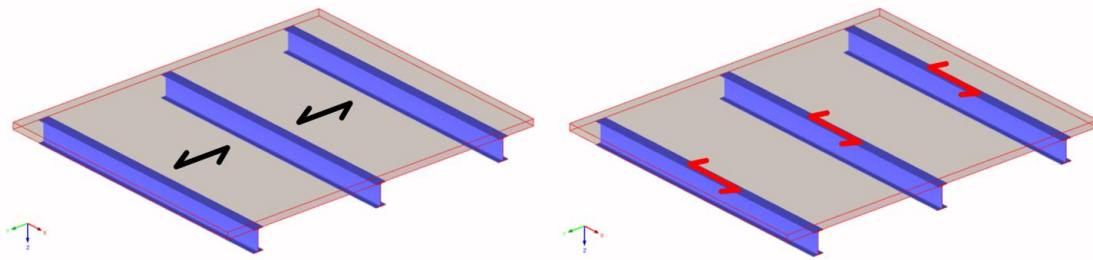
3D visualization of a typical Steel-CLT flooring system [28].
